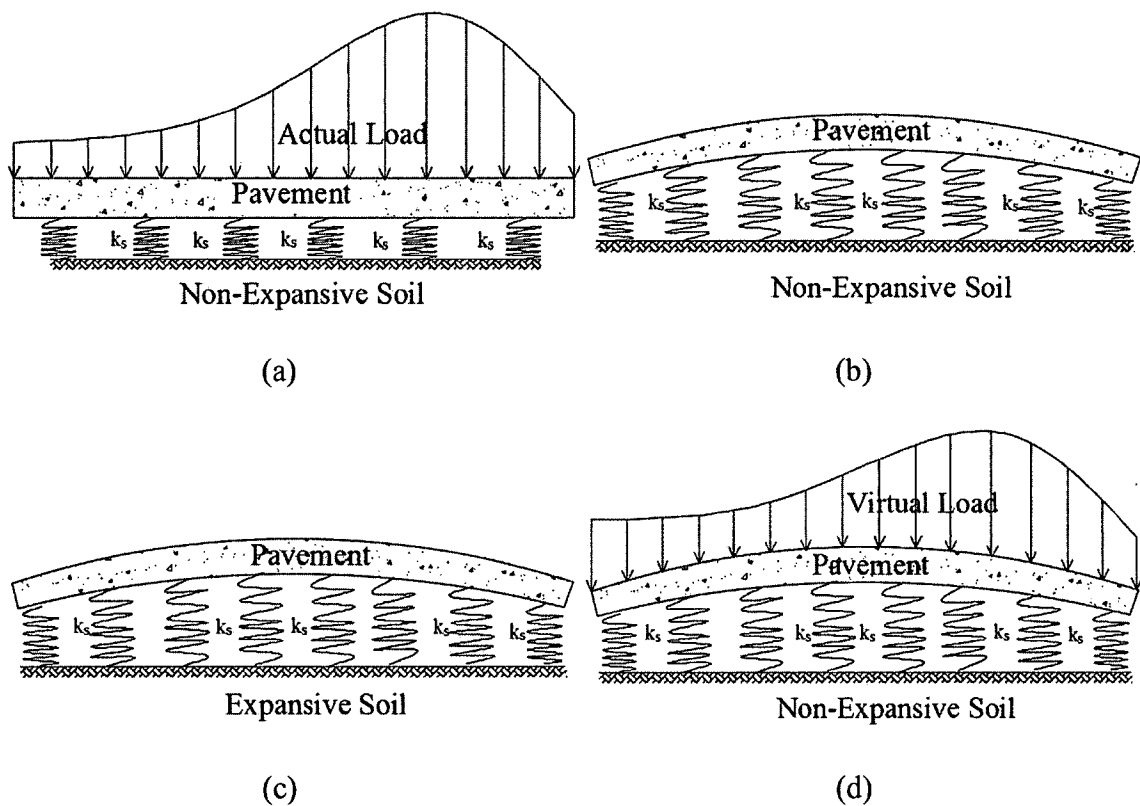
(a) Pavement on a Regular Soil, (b) Pavement Deflection Due to External Load, (c) Pavement Deflection Due to Expansive Soil's Volume Change, and (d) Proposed Virtual Load Soil Model
